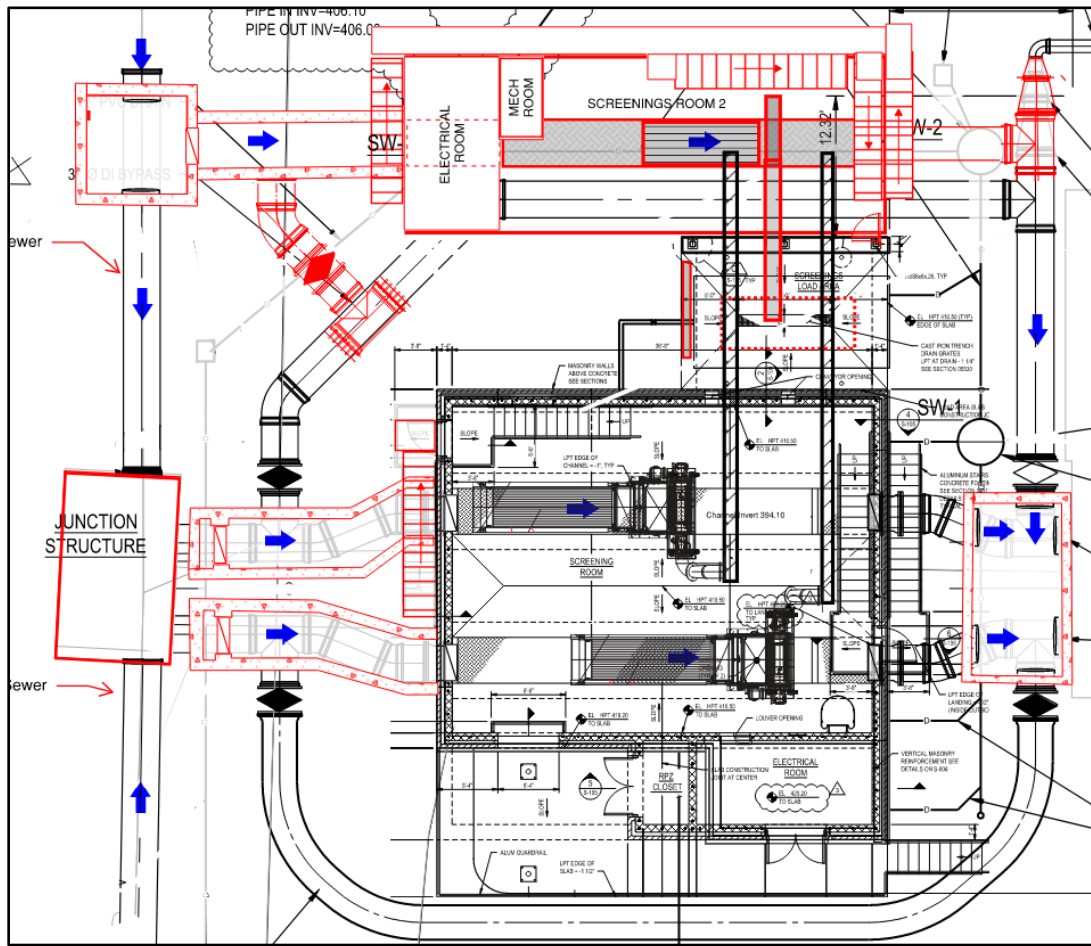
Alternative 3 - New Screening Building to the North
